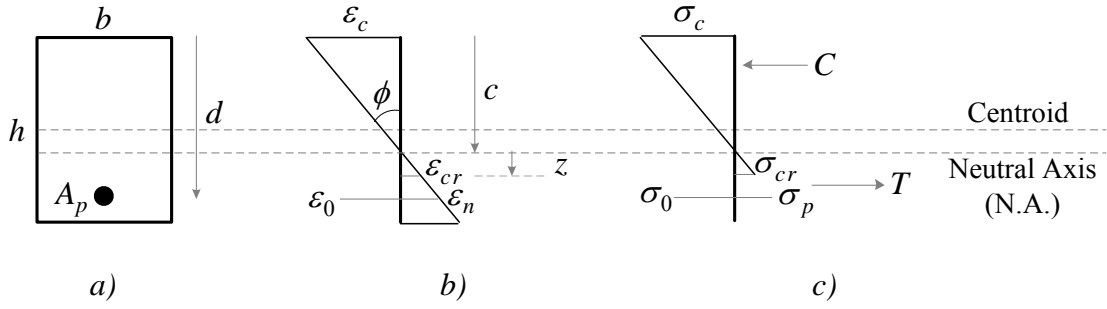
Cracked section under service load; a) prestressed section, b) strain profile, and c) stress profile
